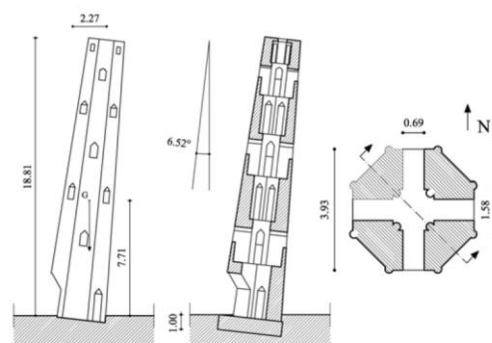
Elevation, section and plan of Huzhu Pagoda.
